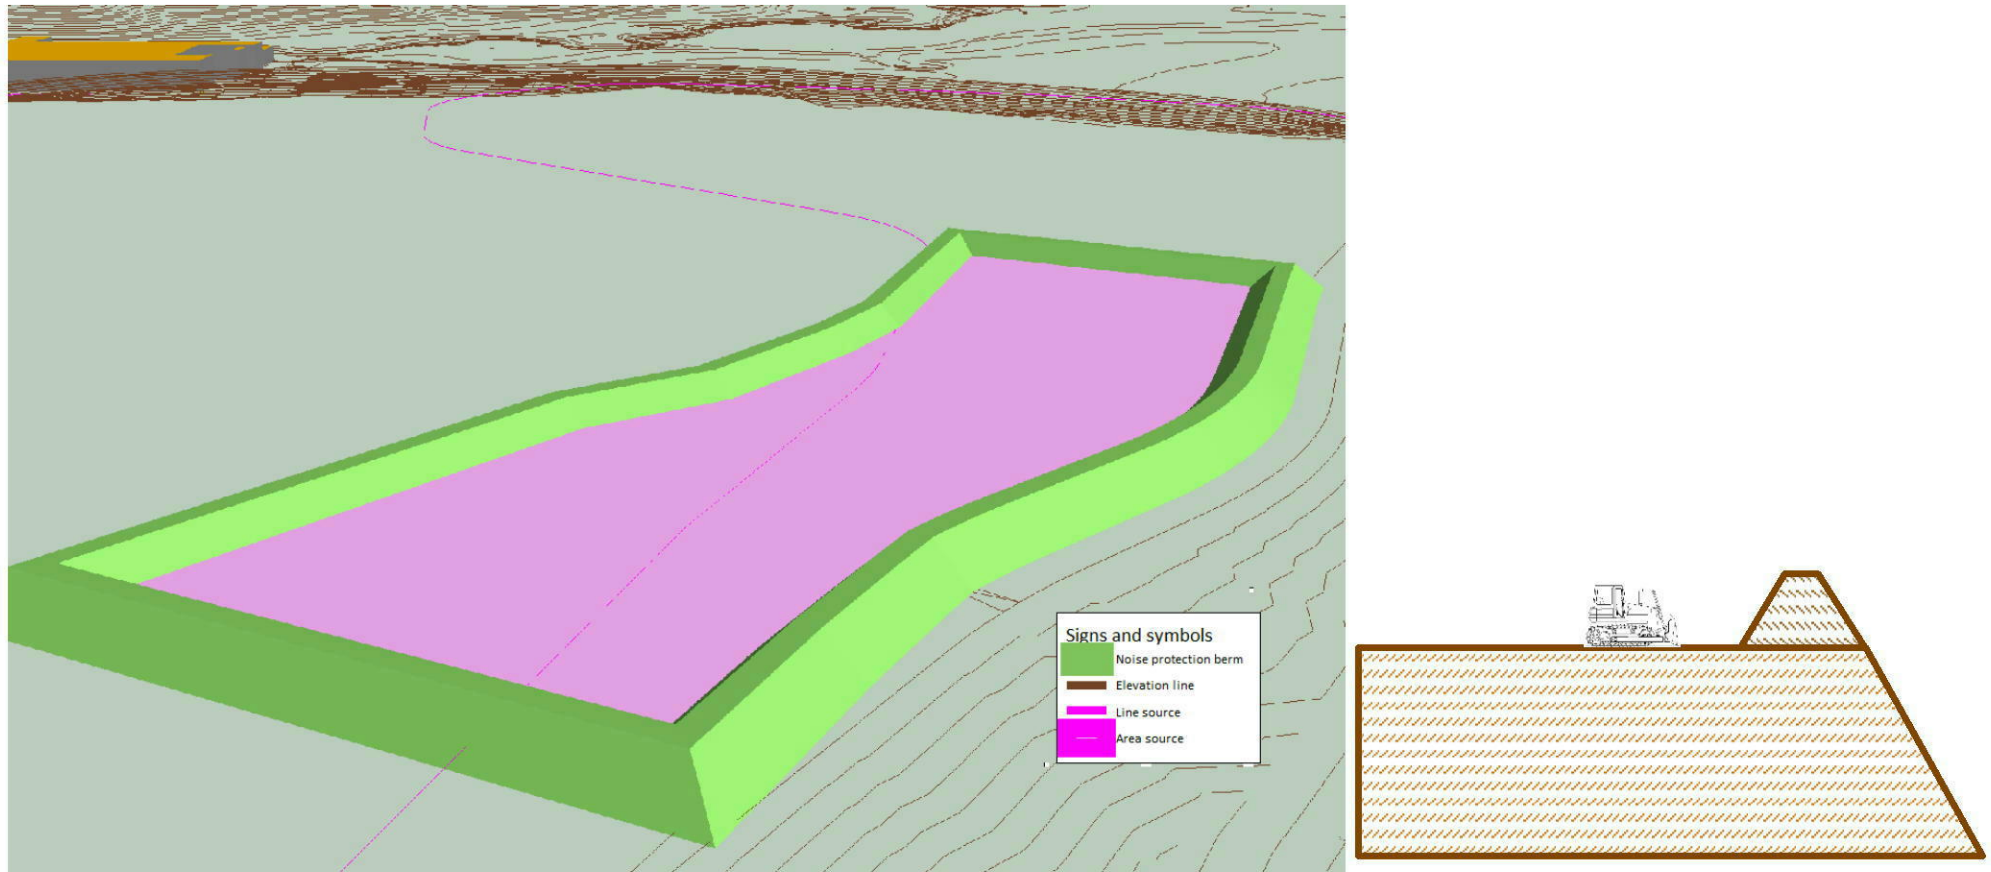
Image looking northwest showing the modelled noise protection berm positioned at the eastern edge of the RL65 contour line (left).Not to scale Cross section of berm (right)
